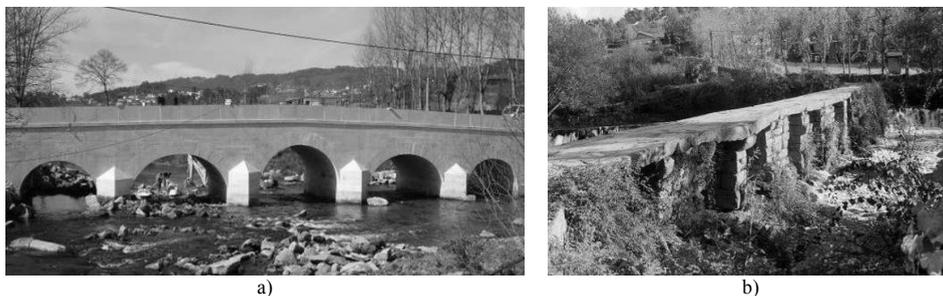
Vila Fria Bridge. a) new bridge and b) old passage.
